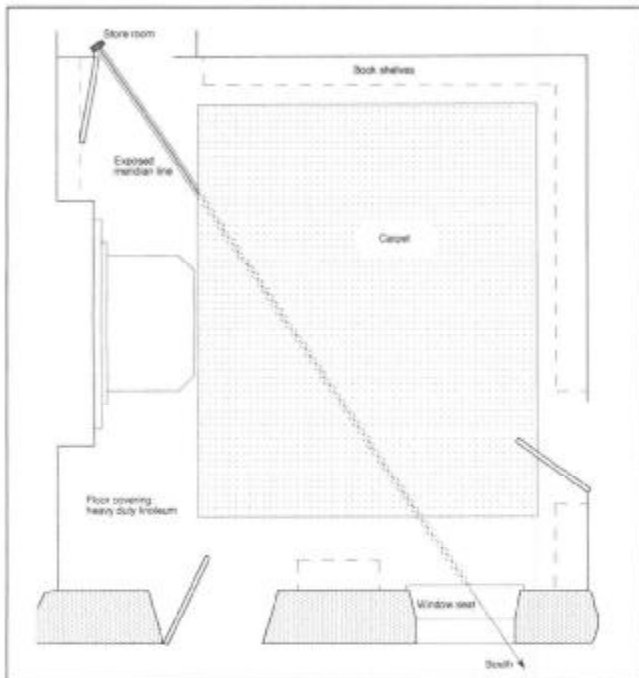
Plan of the Standfast Room. From this plan the meridian line is at an angle of  $55.3^\circ$  to the wall.
